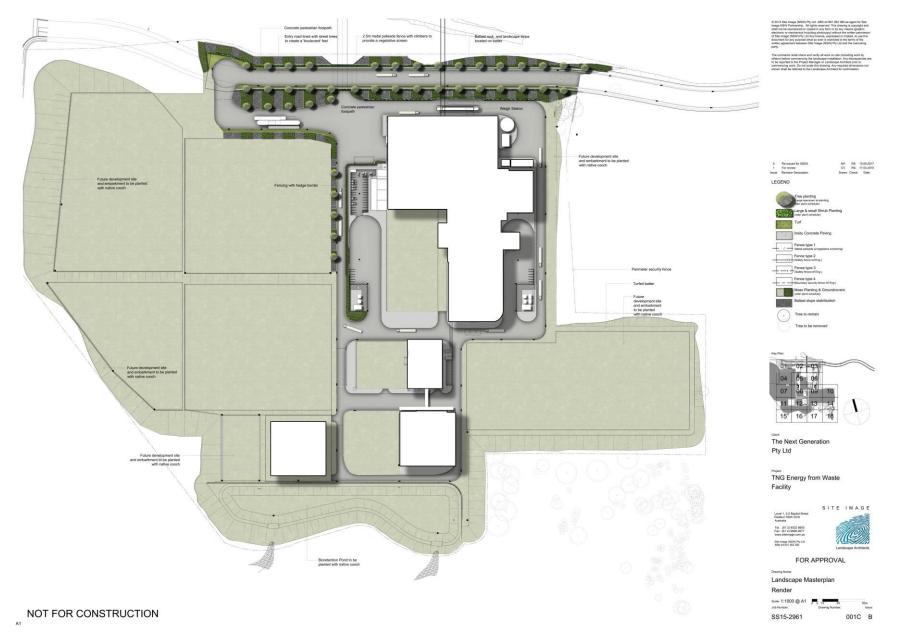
SITE LANDSCAPE MASTER PLAN (SOURCE: SITE IMAGE)
